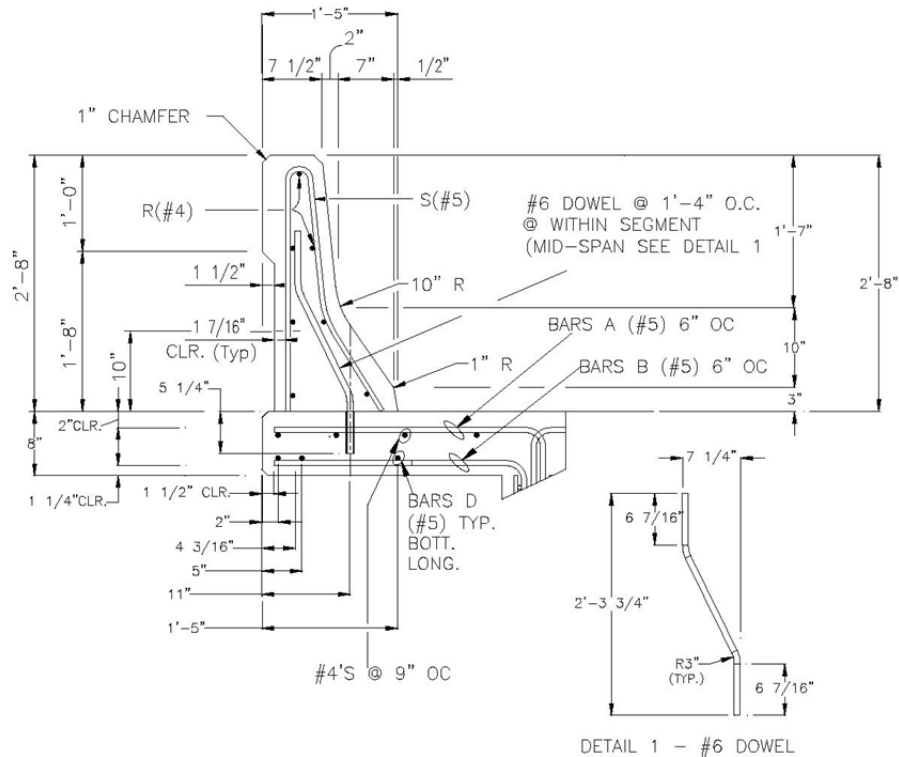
Epoxy Anchor Retrofit for the Texas T501 Barrier [49]
